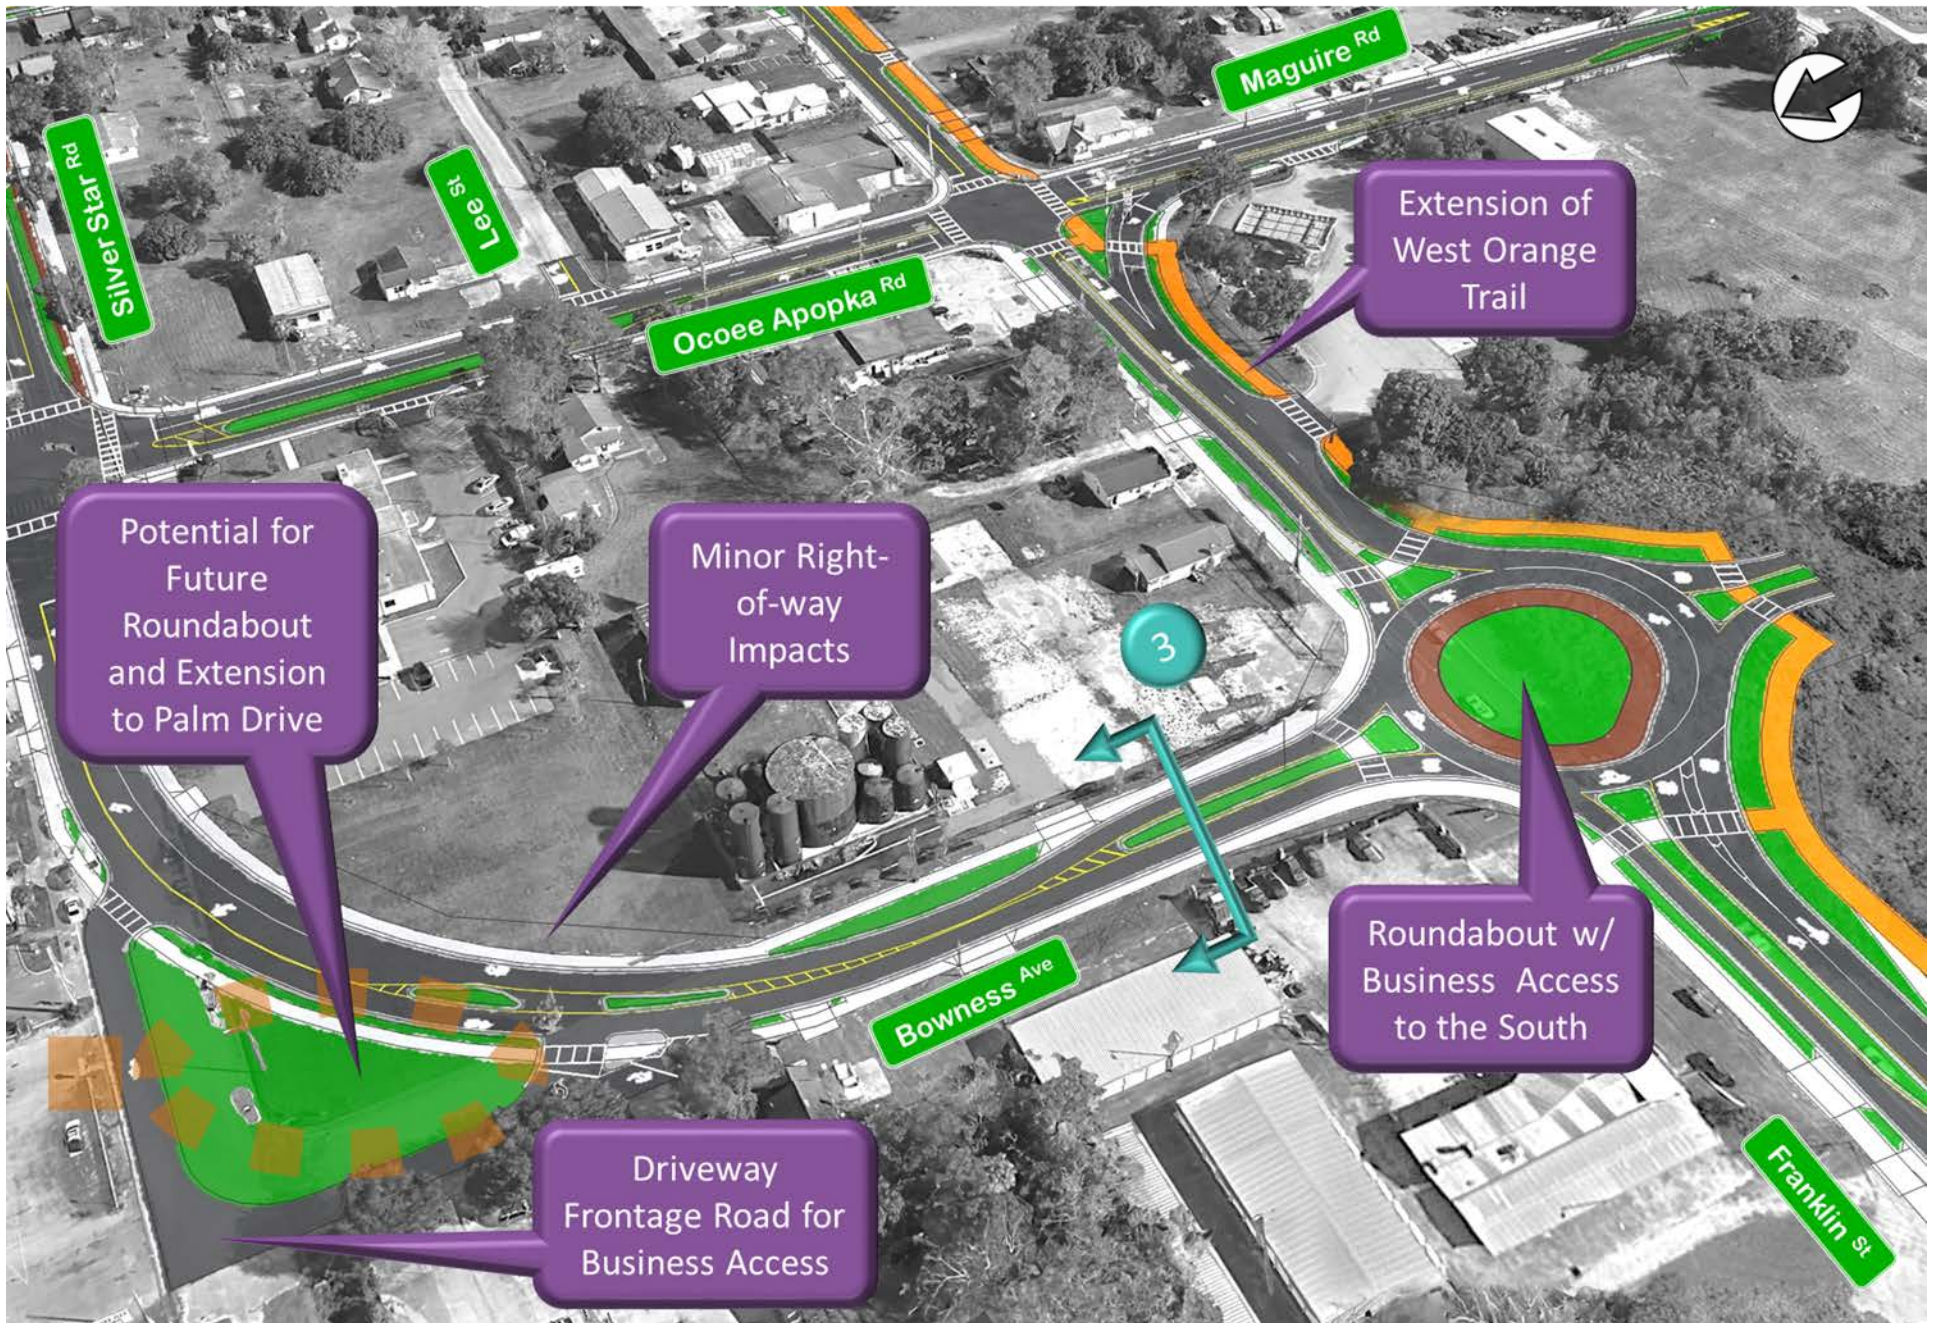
| Concept Plan – Bowness Avenue to Silver Star Road Realignment
